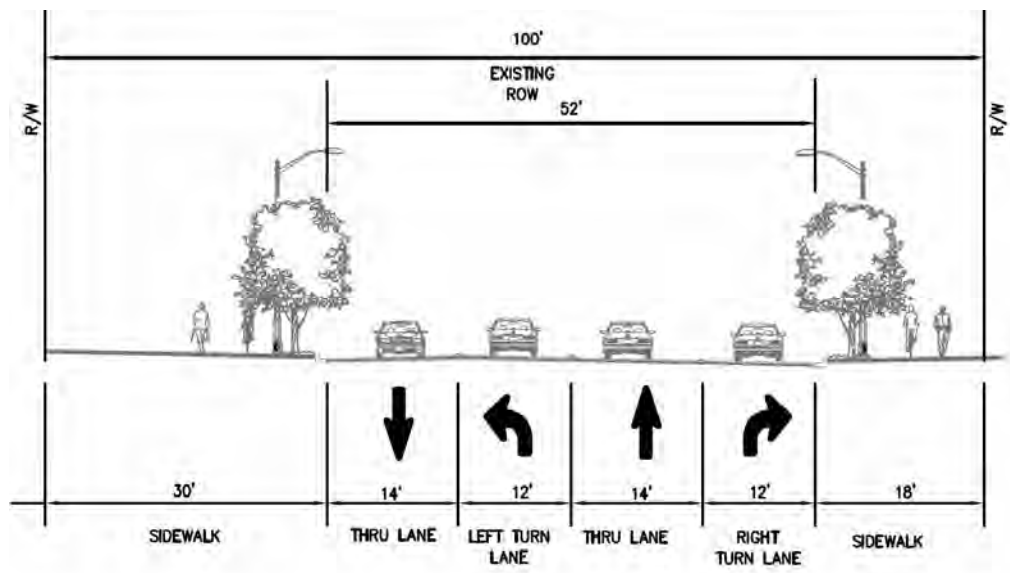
Proposed Cross Section, 3rd Avenue At Signalized Intersections
